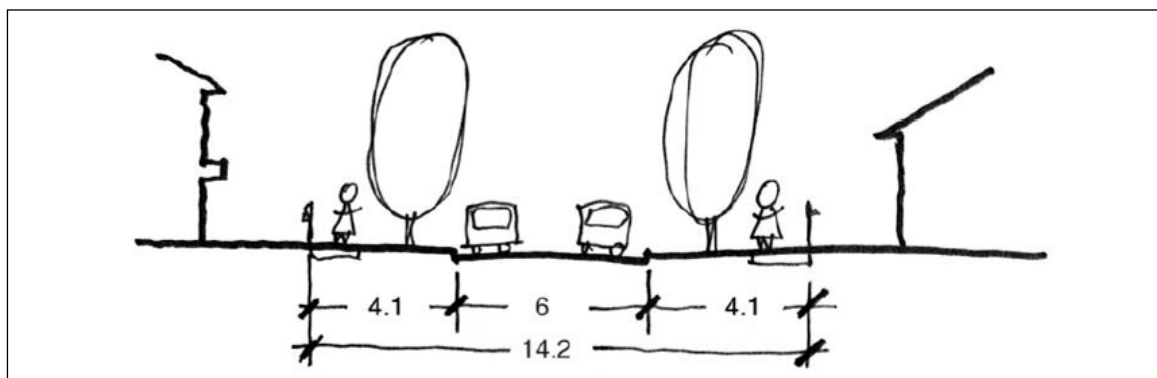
Sample Road Cross Section Narrow Yield Access Street, 40km.hr, <1000vpd
